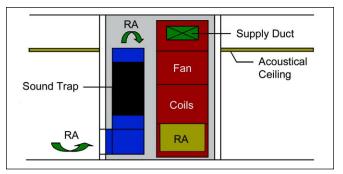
C: Front elevation view of classroom HVAC unit in closet.
